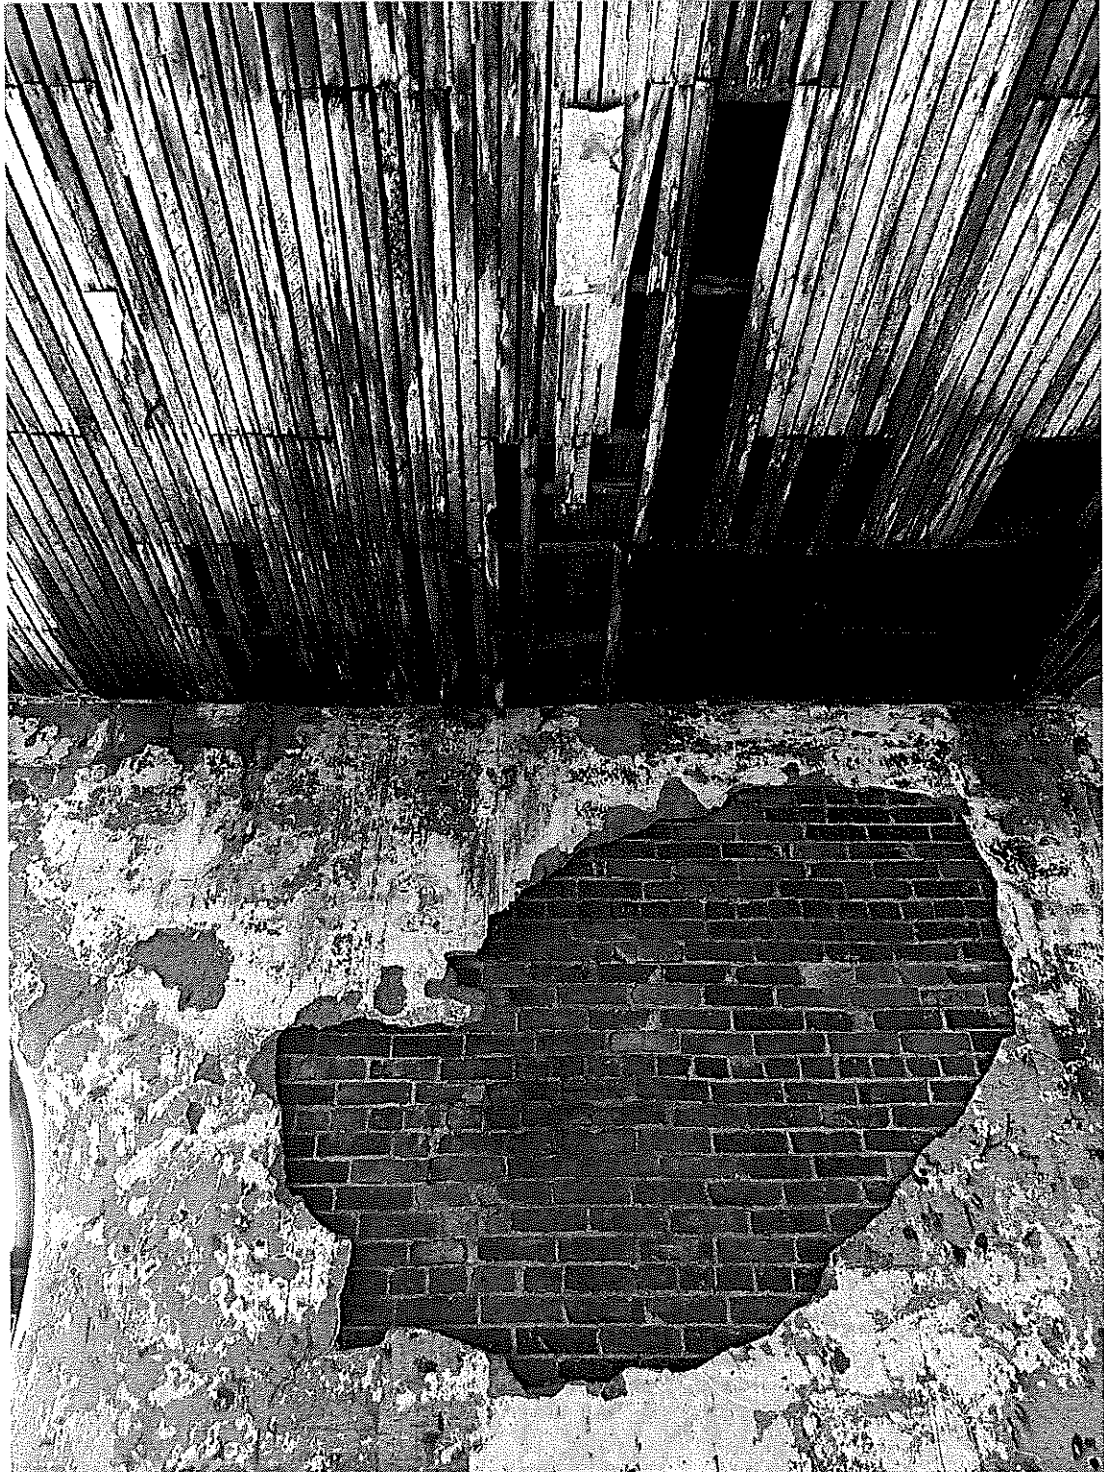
Ceiling damage at North wall due to water infiltration.
